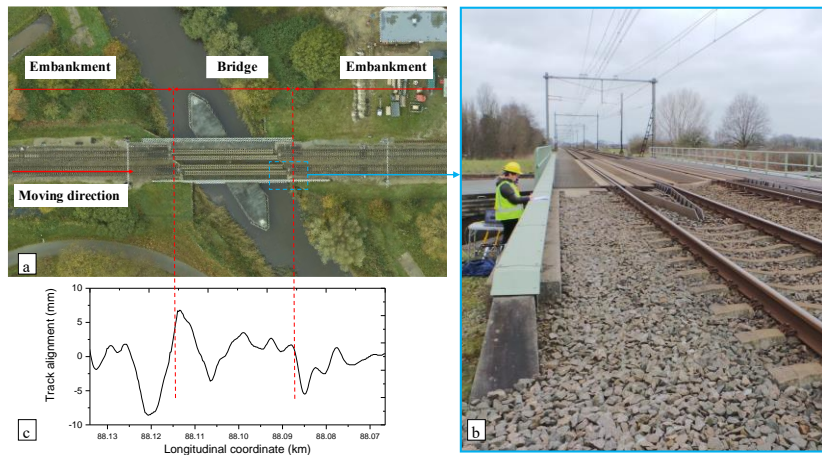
Typical railway transition zone: (a) Top view, (b) Side view, (c) Track longitudinal level.
